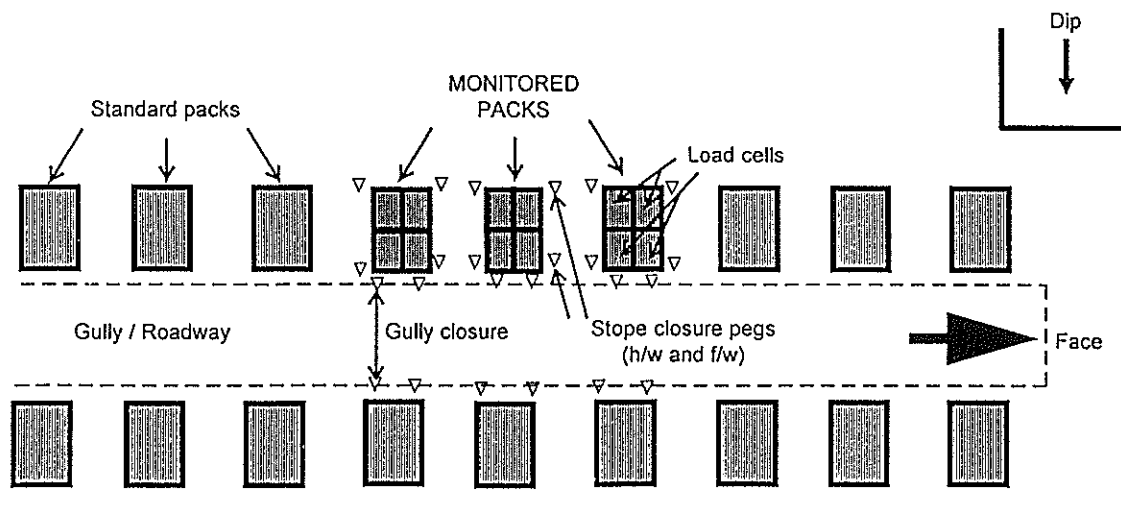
Schematic layout of instrumented gully packs and 'standard' gully packs (example of follow-behind gully configuration)
